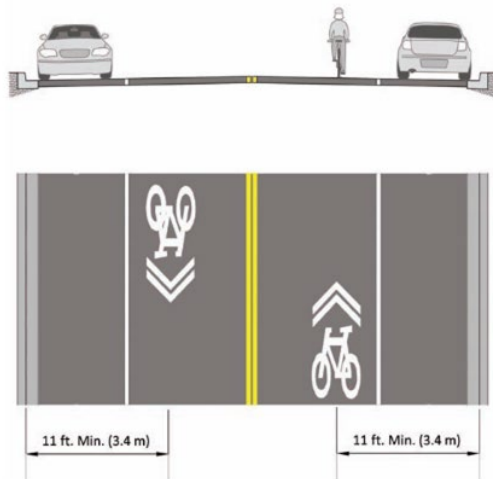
Typical Shared-Lane Marking Cross Section on Street with Parking
